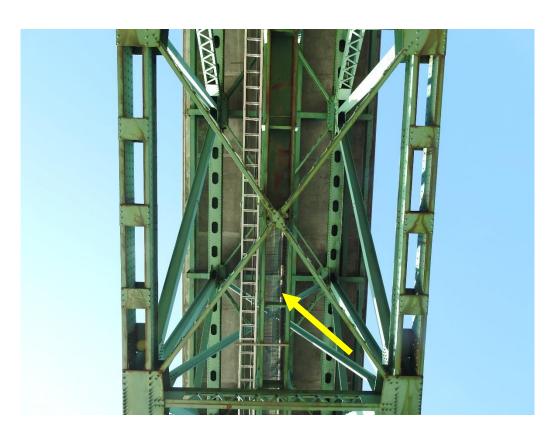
Underside view of approach truss showing longitudinal access catwalk
